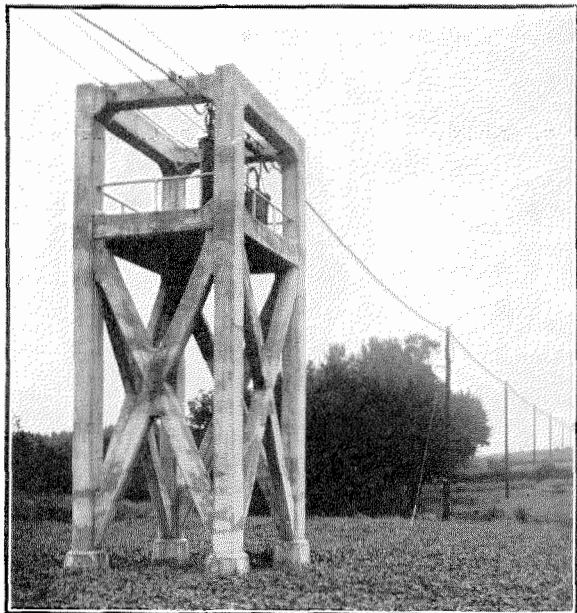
Reinforced Concrete Aerial Cable and Loading Coil Platform.
